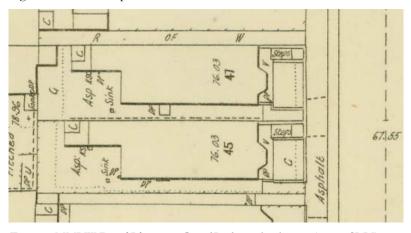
MMBW Detail Plan 946, City of Prahran, dated 1895 (source: SLV).
